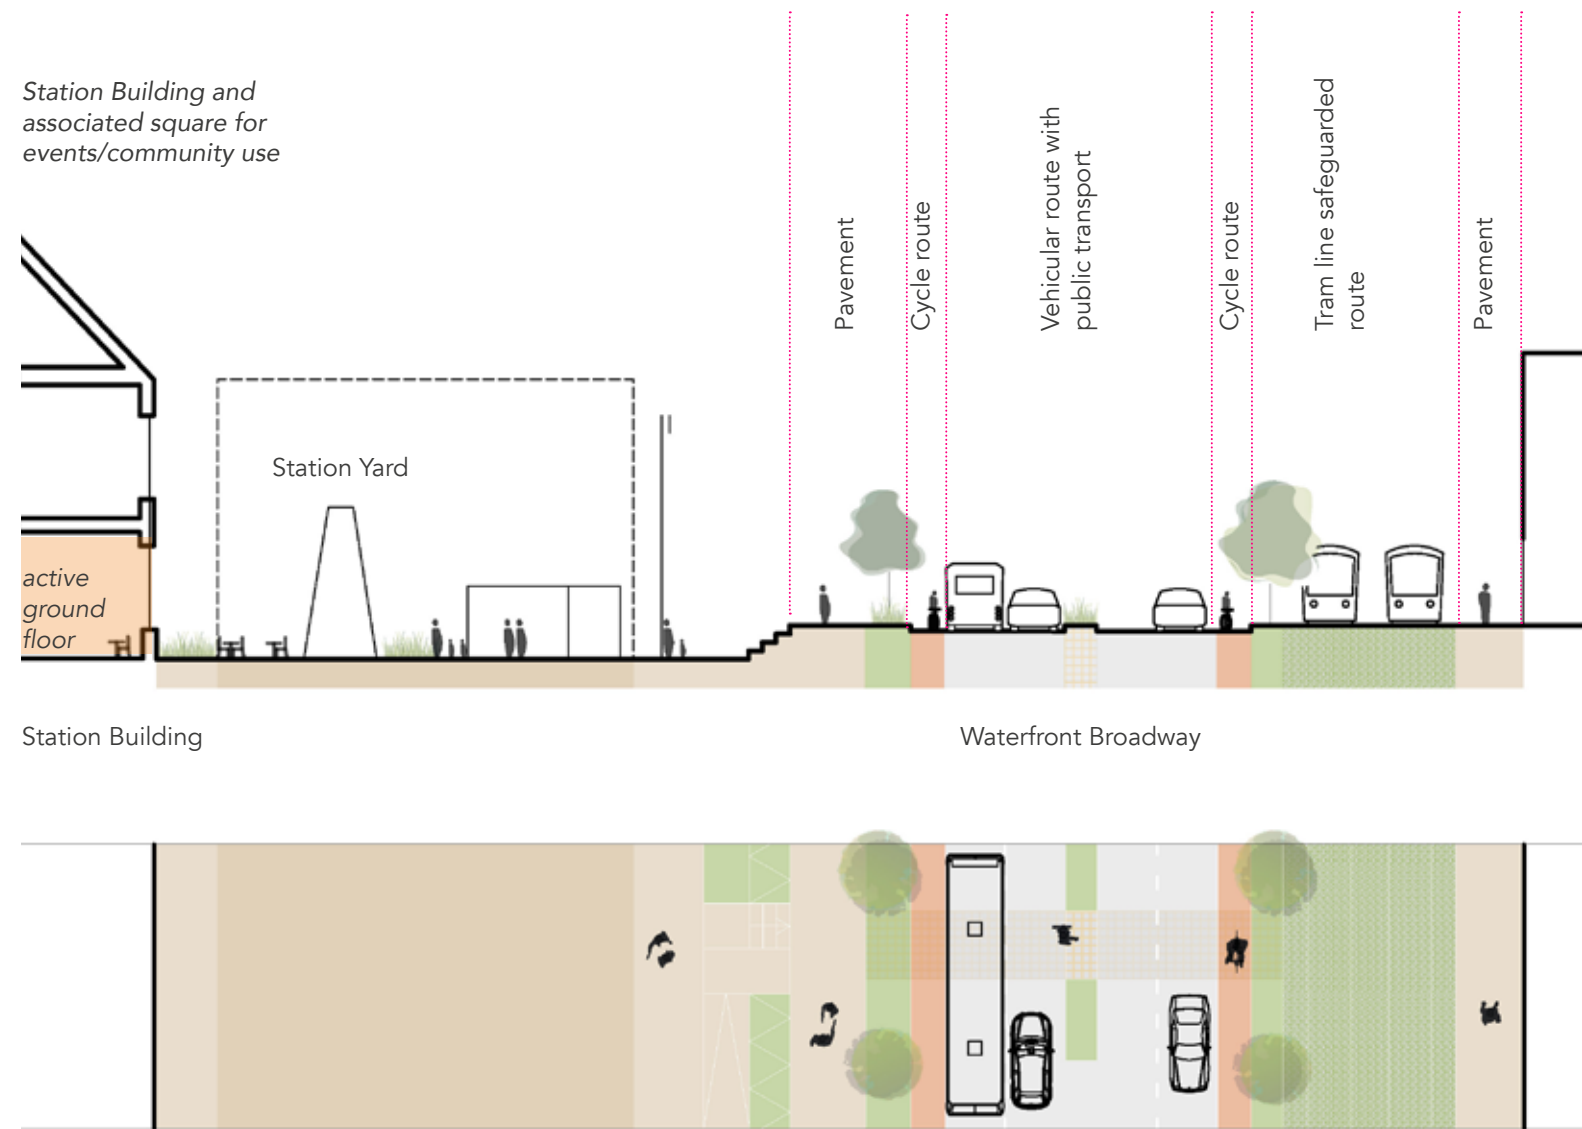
Illustrative section and plan for Waterfront Broadway
